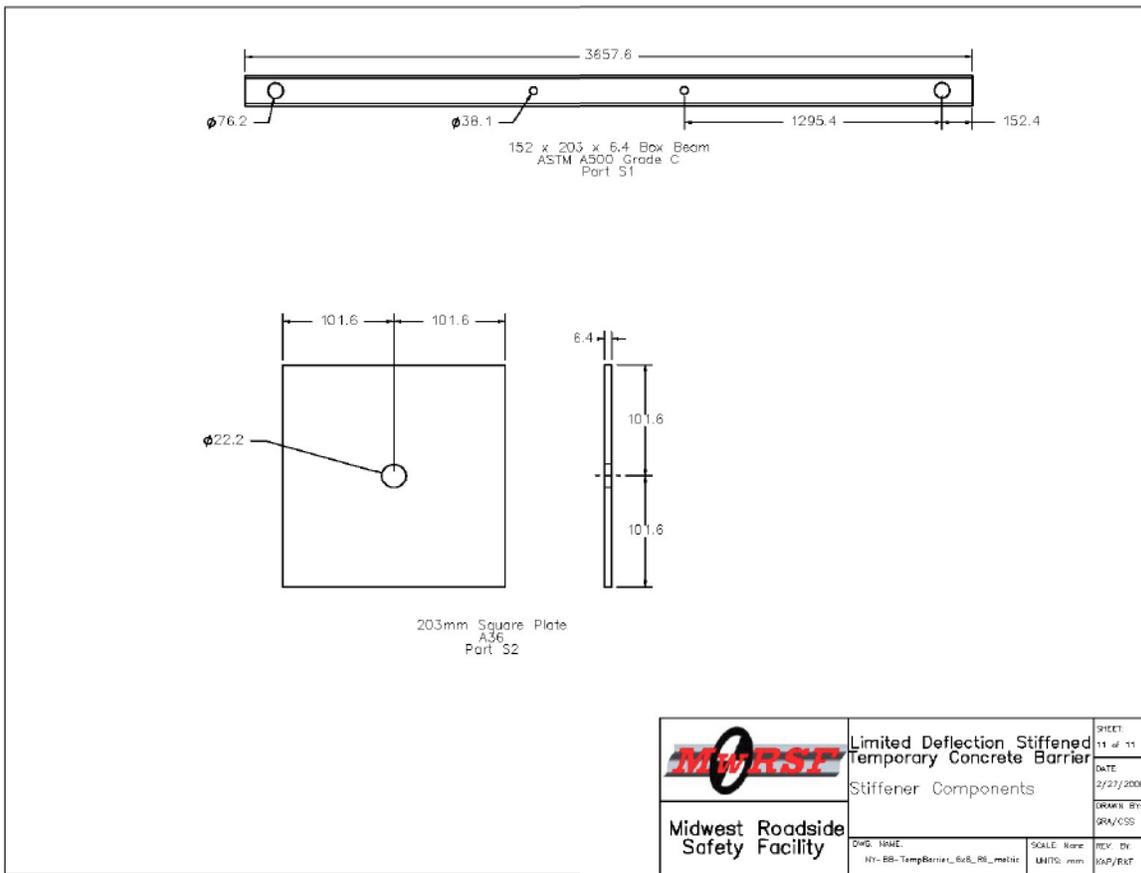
Box Beam Stiffener Details, Test NYTCB-3
